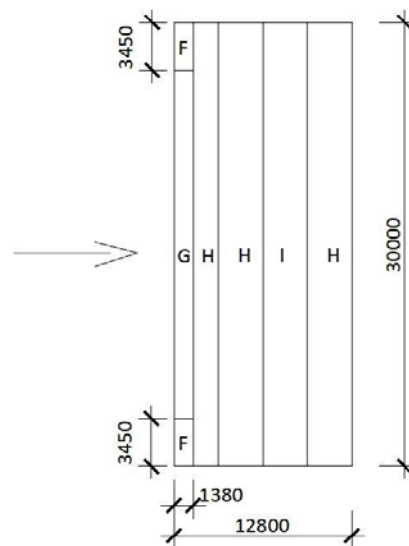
Wind load fields in multispan roofs [source: authors' archive]
